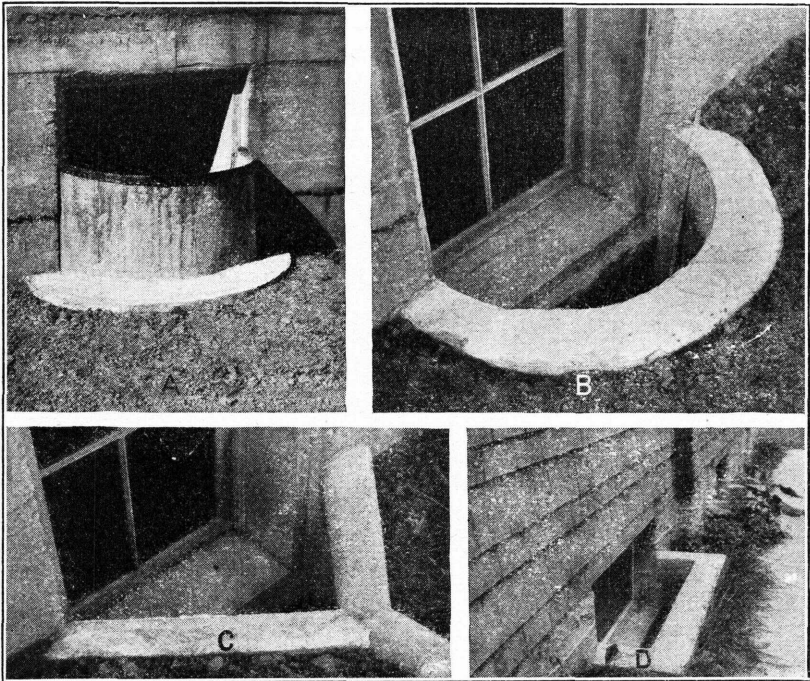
Shallow concrete walls to restrain grading around cellar windows: A, Steel form used to shape a half-round concrete wall; B, completed well 20 inches deep; C, V-shaped well; D, shallow rectangular well
